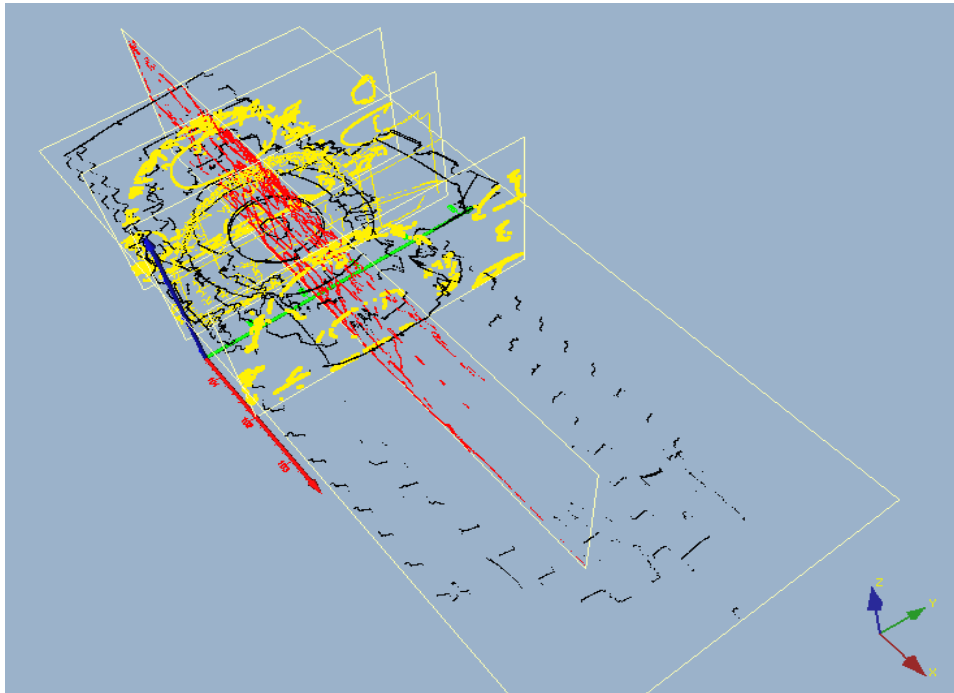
Interconnected vertical and horizontal sections against the horizontal background.
